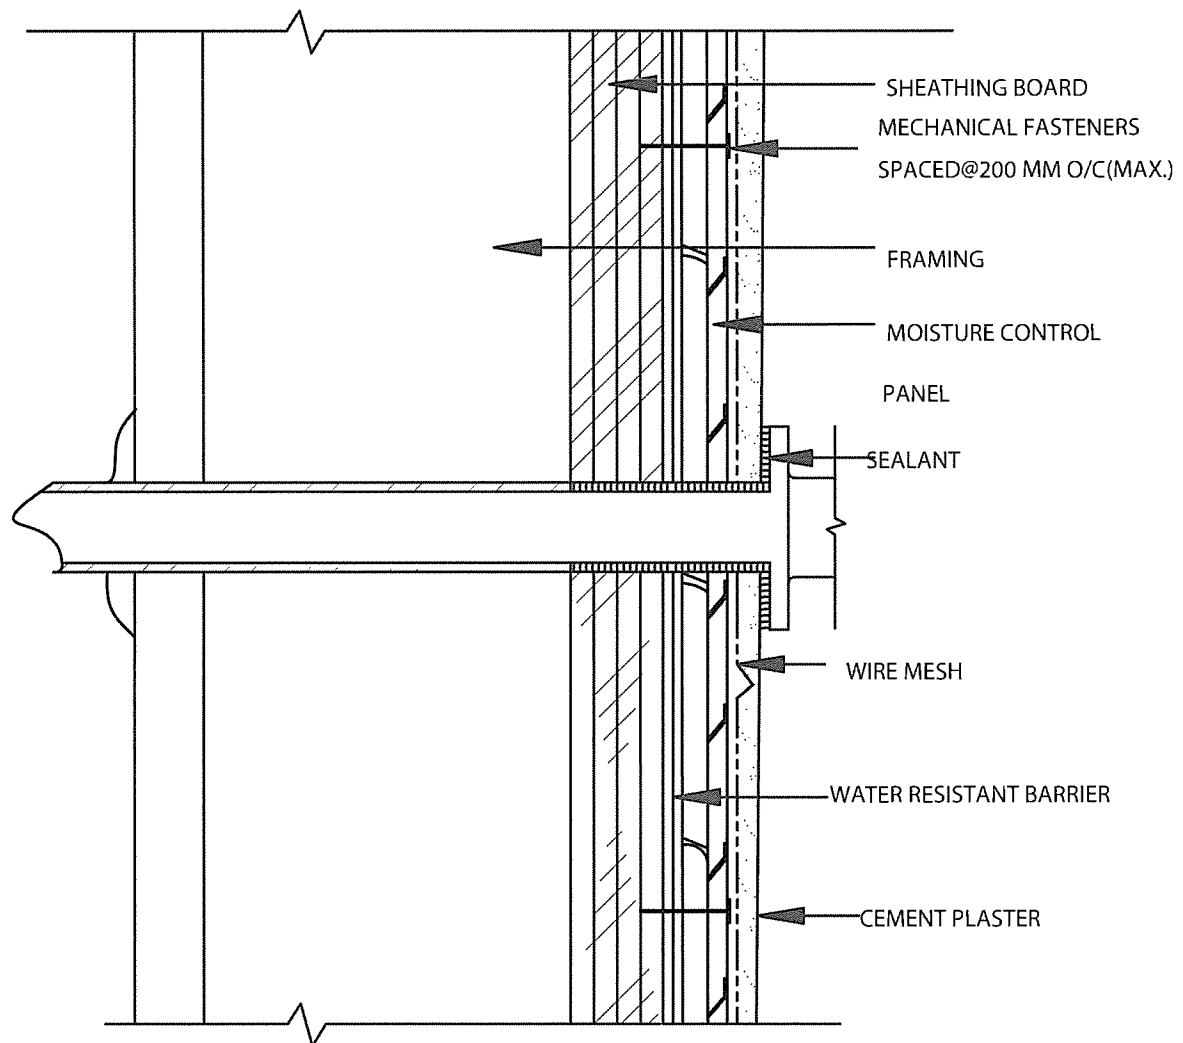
TERMINATION AT CANTILEVERED WALL
